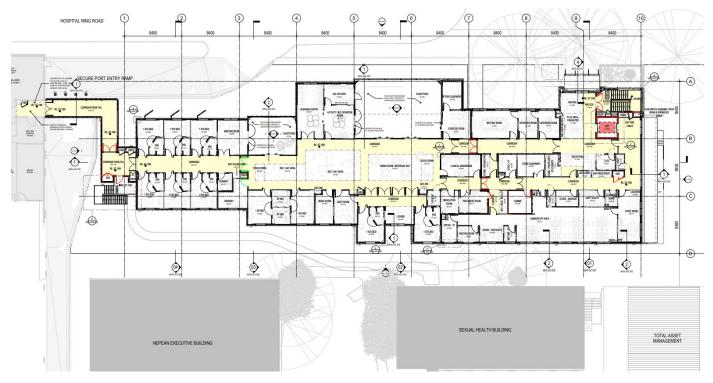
CAMHS level 1 (Level 02) floor plan (STH)
